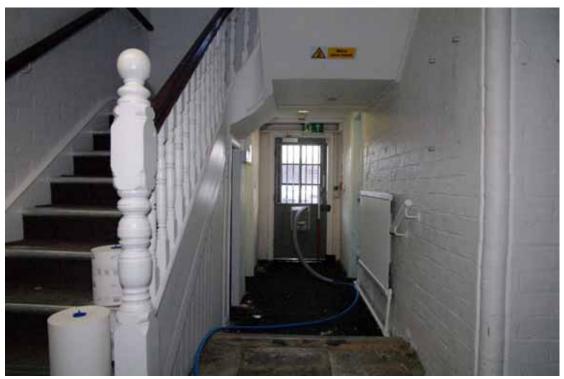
G9 stairs and doorway to rear of 1856 block Looking south-west. 1m scale
